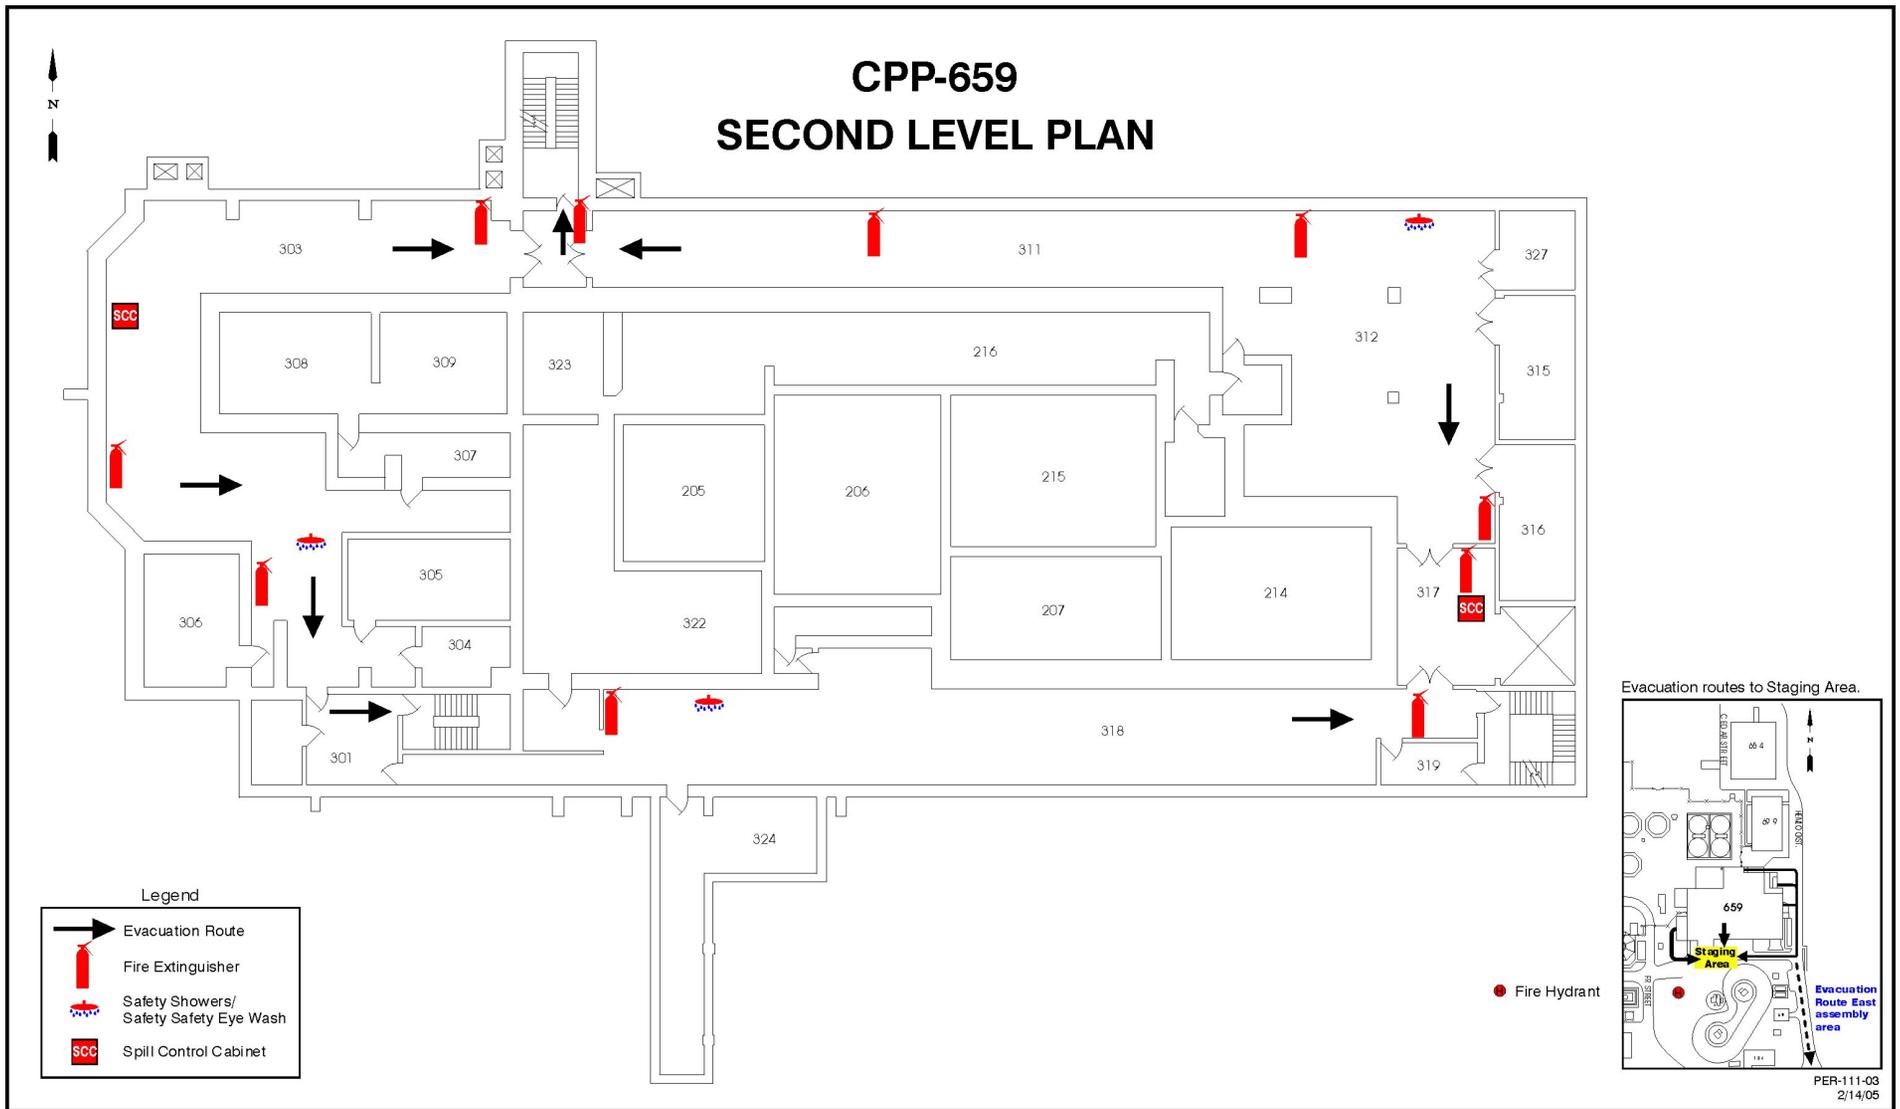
Evacuation Routes and Emergency Equipment, CPP-659 Second Floor
